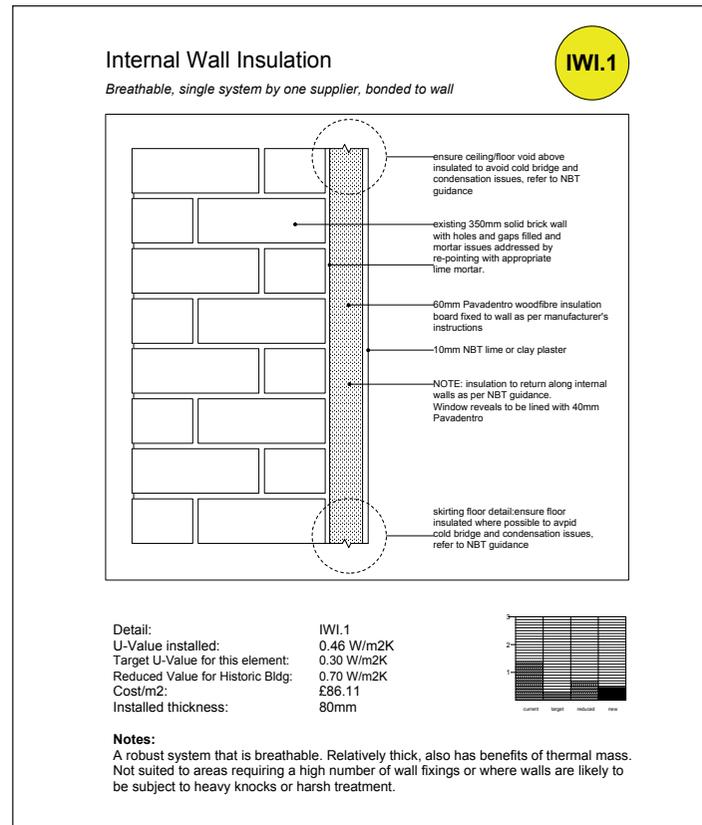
One of a series of detail drawings showing retrofitted environmental upgrade options for walls, floors and ceilings.
